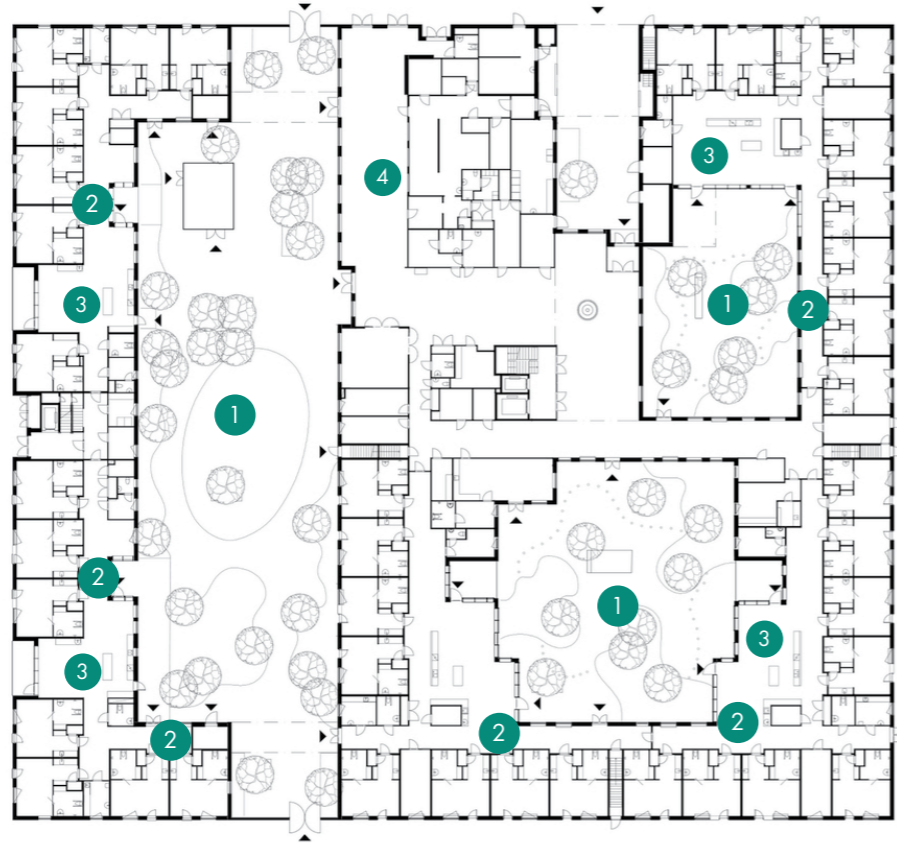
The Gardens Care Home ground floor plan (Scale - 1:500). Source: ArchDaily (2022)
